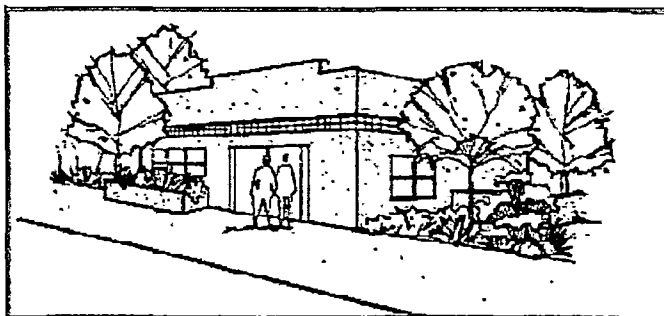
J: A consistent level of detail and finish is required around all sides of a building
